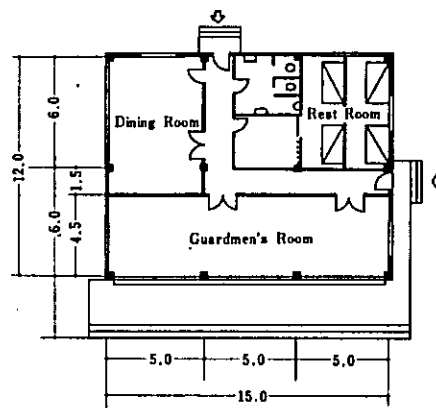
Plan of Main Gatehouse (Unit : m)
